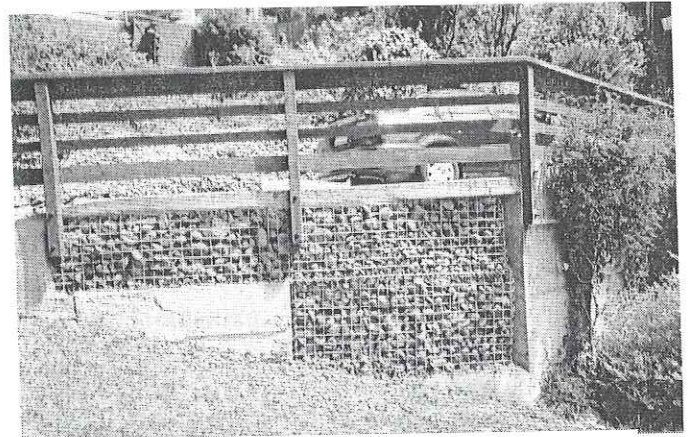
Concrete Faced Gabion Retaining and Parking Structure.
